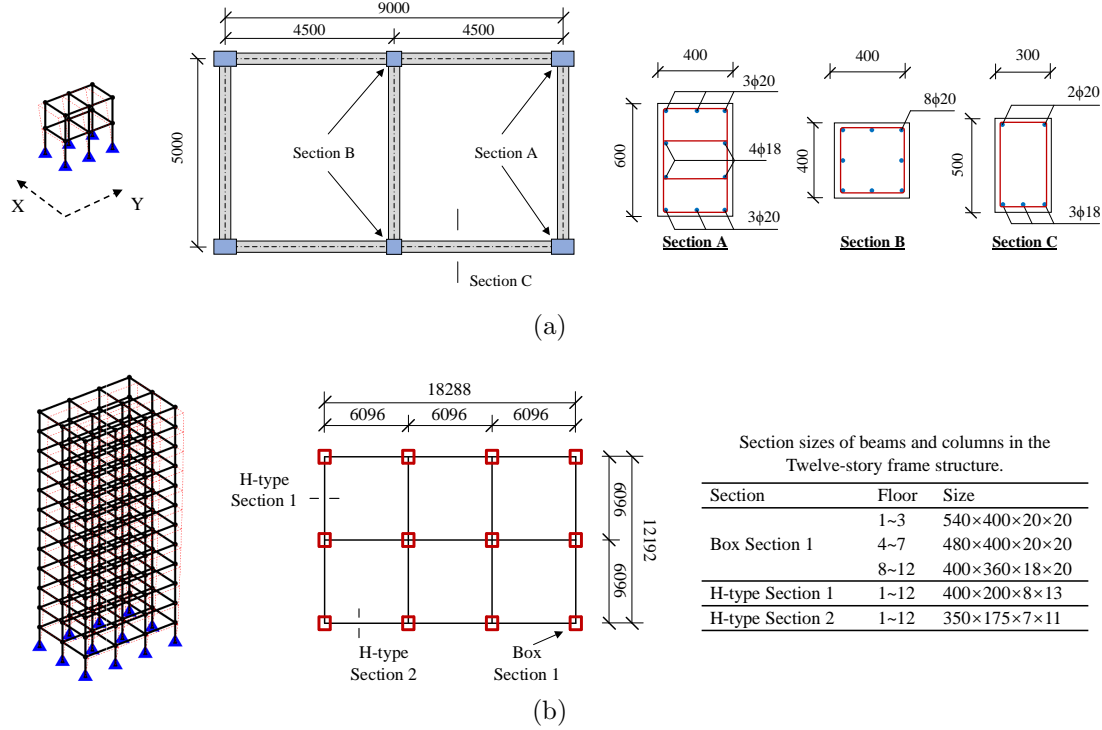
Diagrams and layouts of standard floors and section characteristics of the frame structures. (a) Two-story concrete frame structure; (b) Twelve-story steel frame structure.
